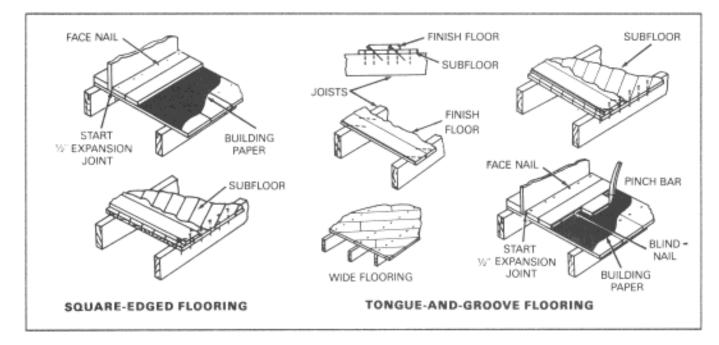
Square-edged and tongue-and-groove finish flooring
